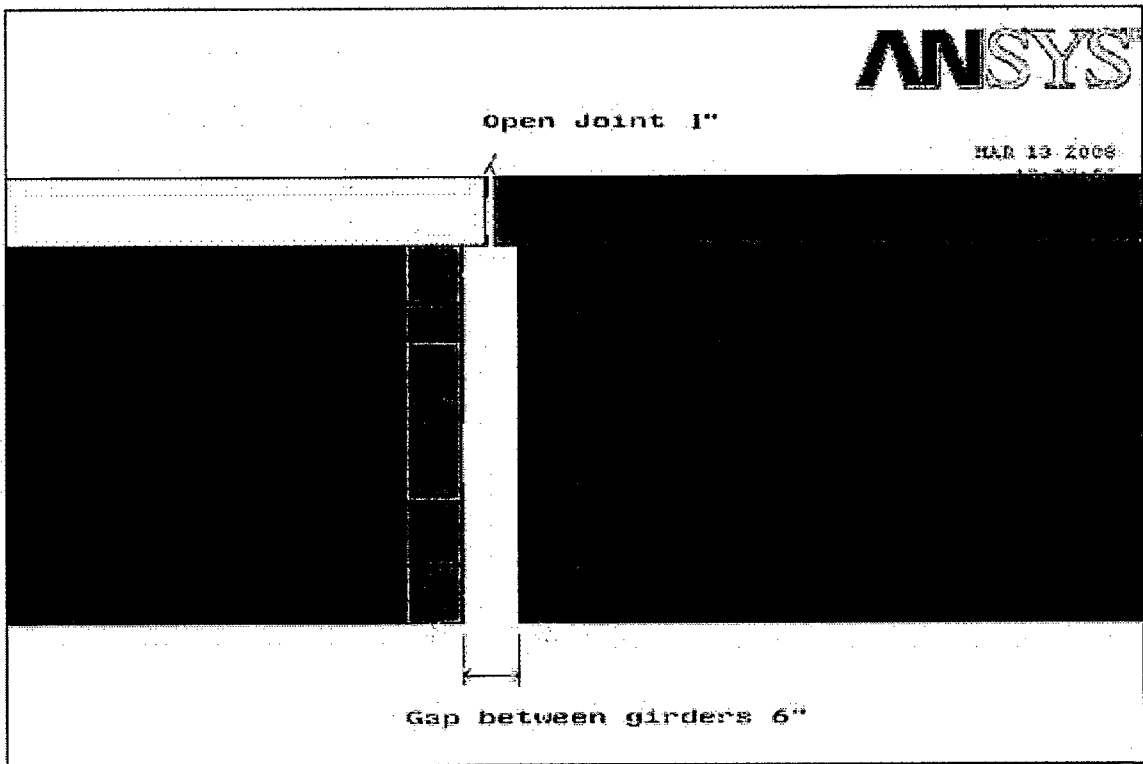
Open Joint and Gap between Girders in Adjacent Spans of a Bridge.
